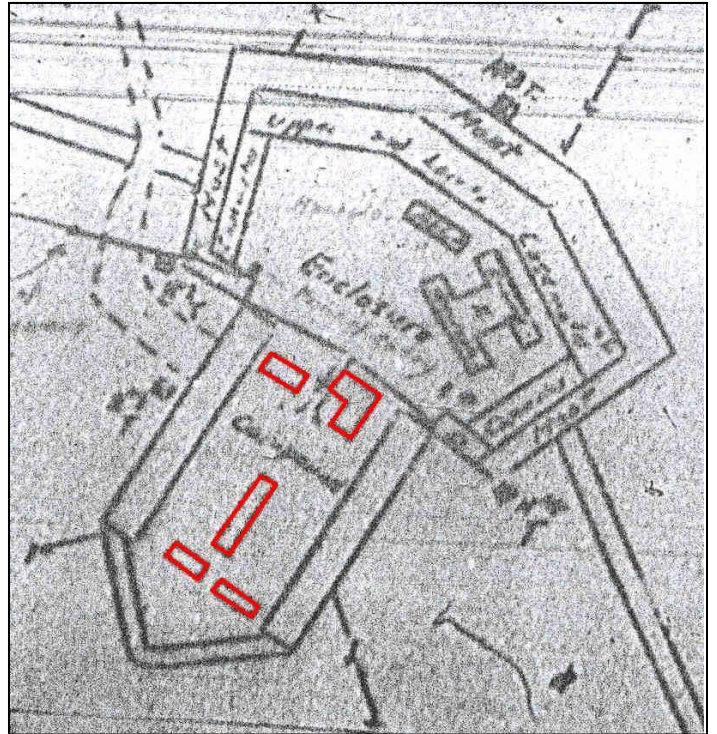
Plan of Fort Henry showing the temporary, WWII structures.
